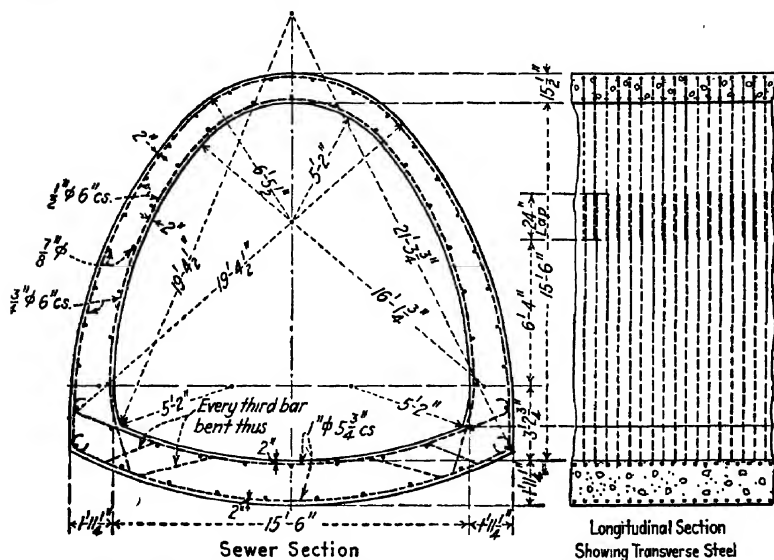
Steel reinforcement of 15½ ft. semielliptical sewer.
